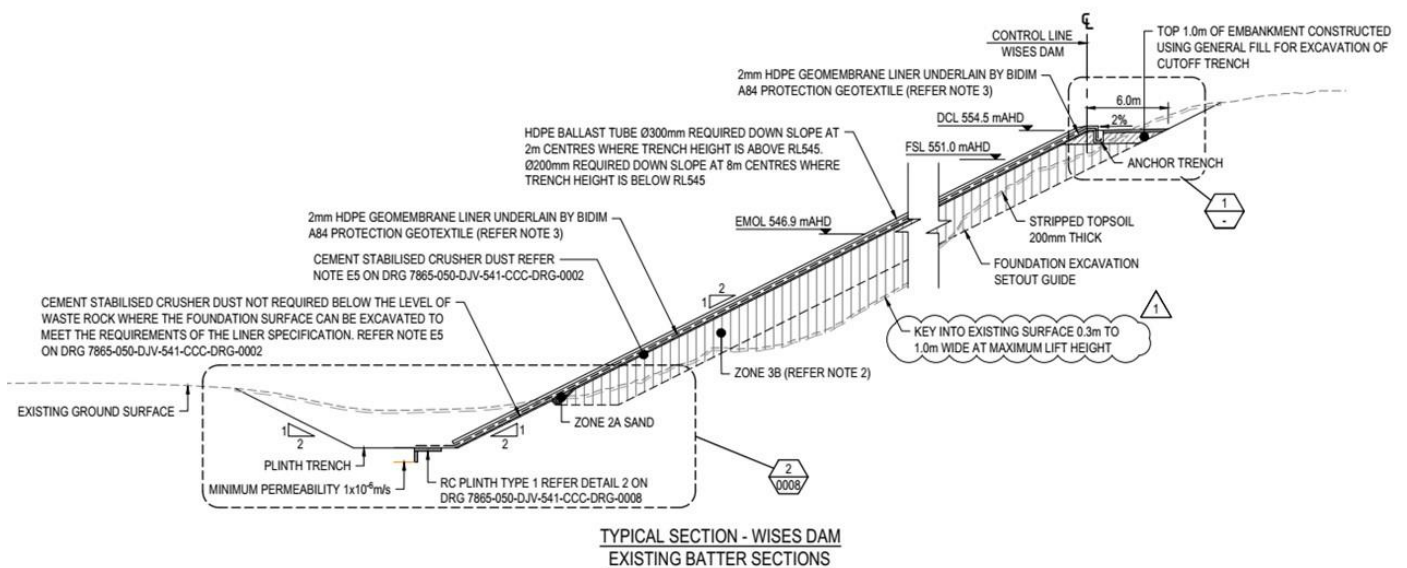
Typical Section of Embankment placed against existing waste rock stockpile
